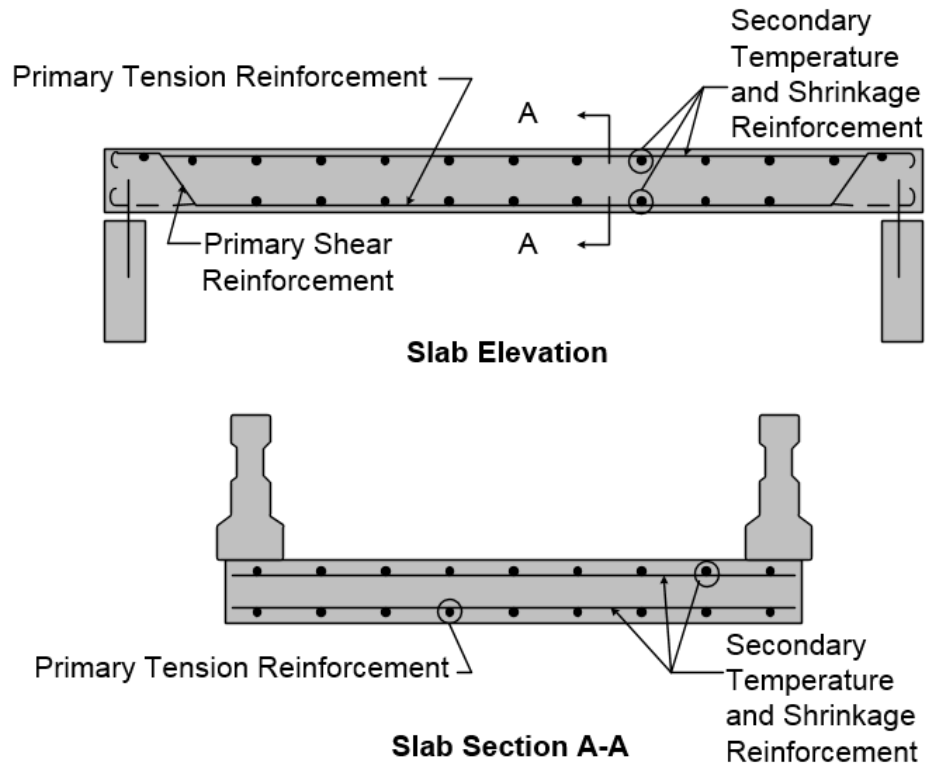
Steel Reinforcement in a Simply Supported Concrete Slab
